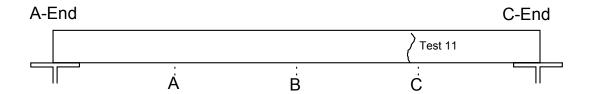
Cracks formed during concentrated load tests of the recast fiber-reinforced slab 1 (Recast STRUX 1)
